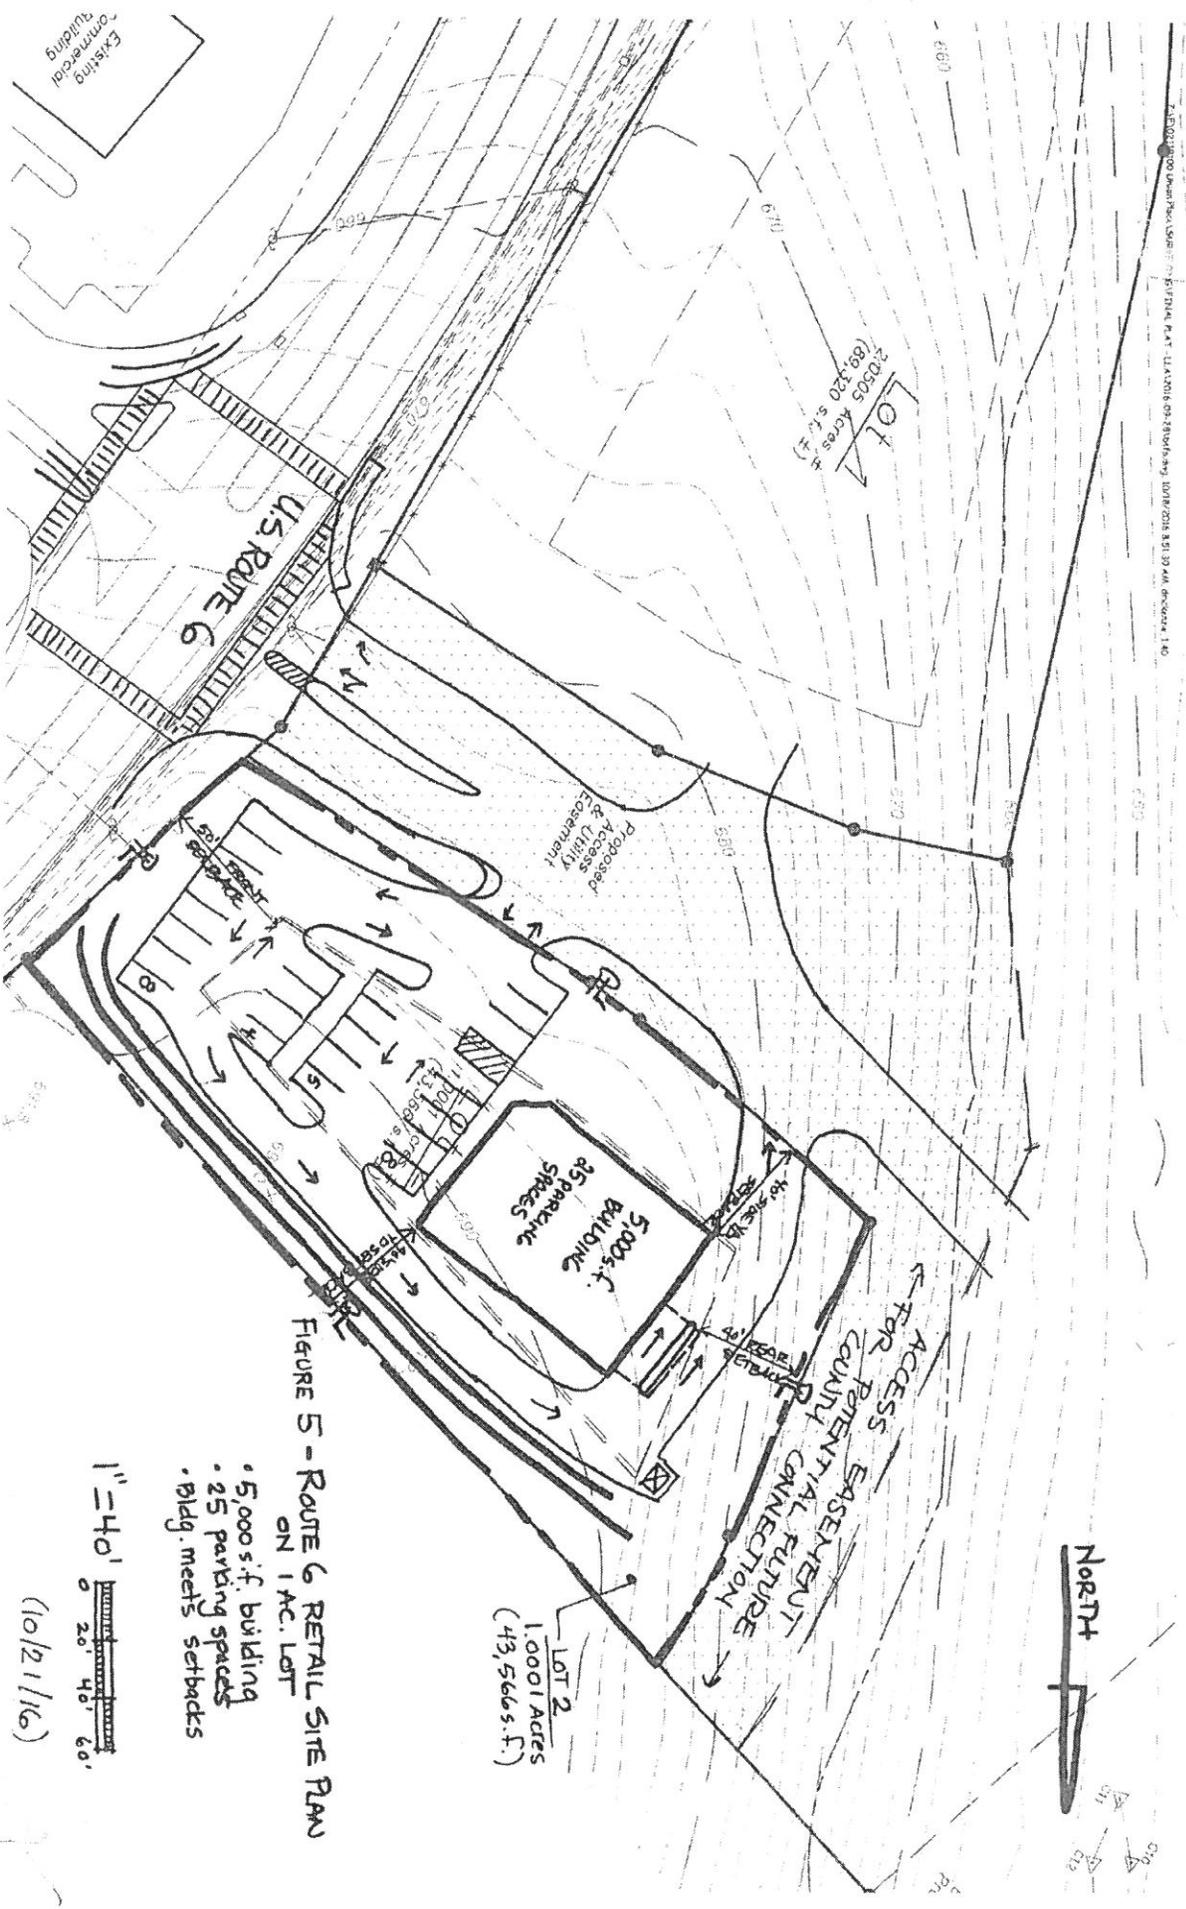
ROUTE 6 RETAIL SITE PLAN ON 1 AC. LOT
